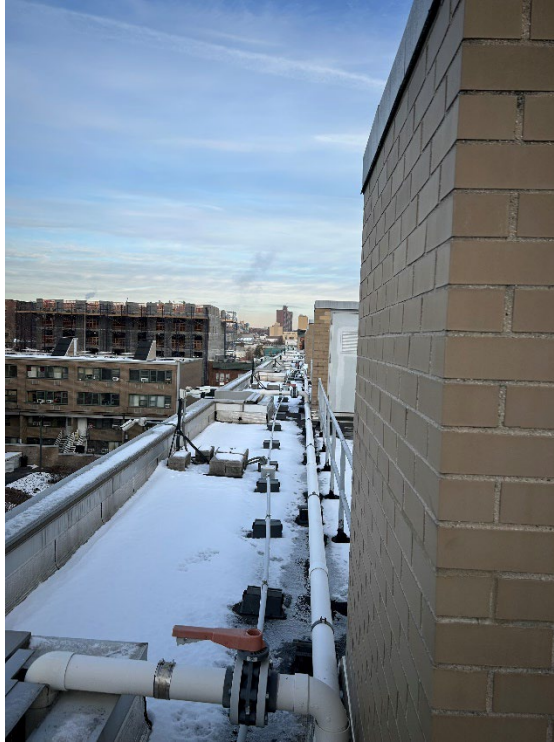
View showing Blower A SSDS piping run along the roof with legs heading down the side of the building.
